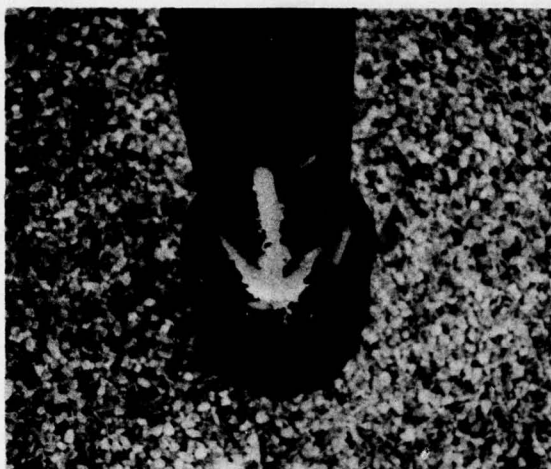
Cracked bitumen in a pitch pocket surrounding a vent pipe.
